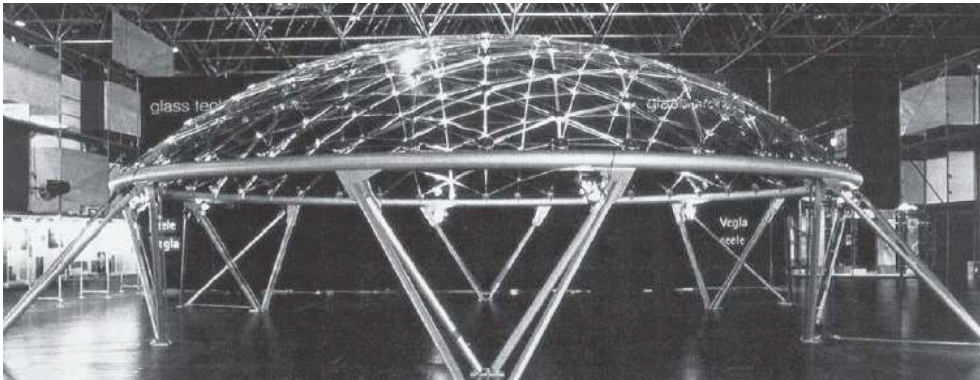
Multi-faceted steel and glass shell (Wurm, 2007)
